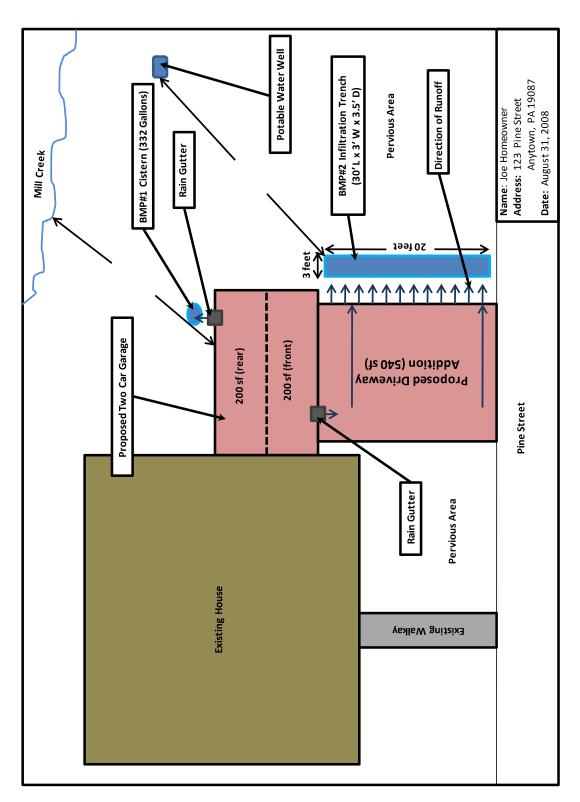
Example of Simplified Stormwater Management Site Plan for Joe Homeowner
